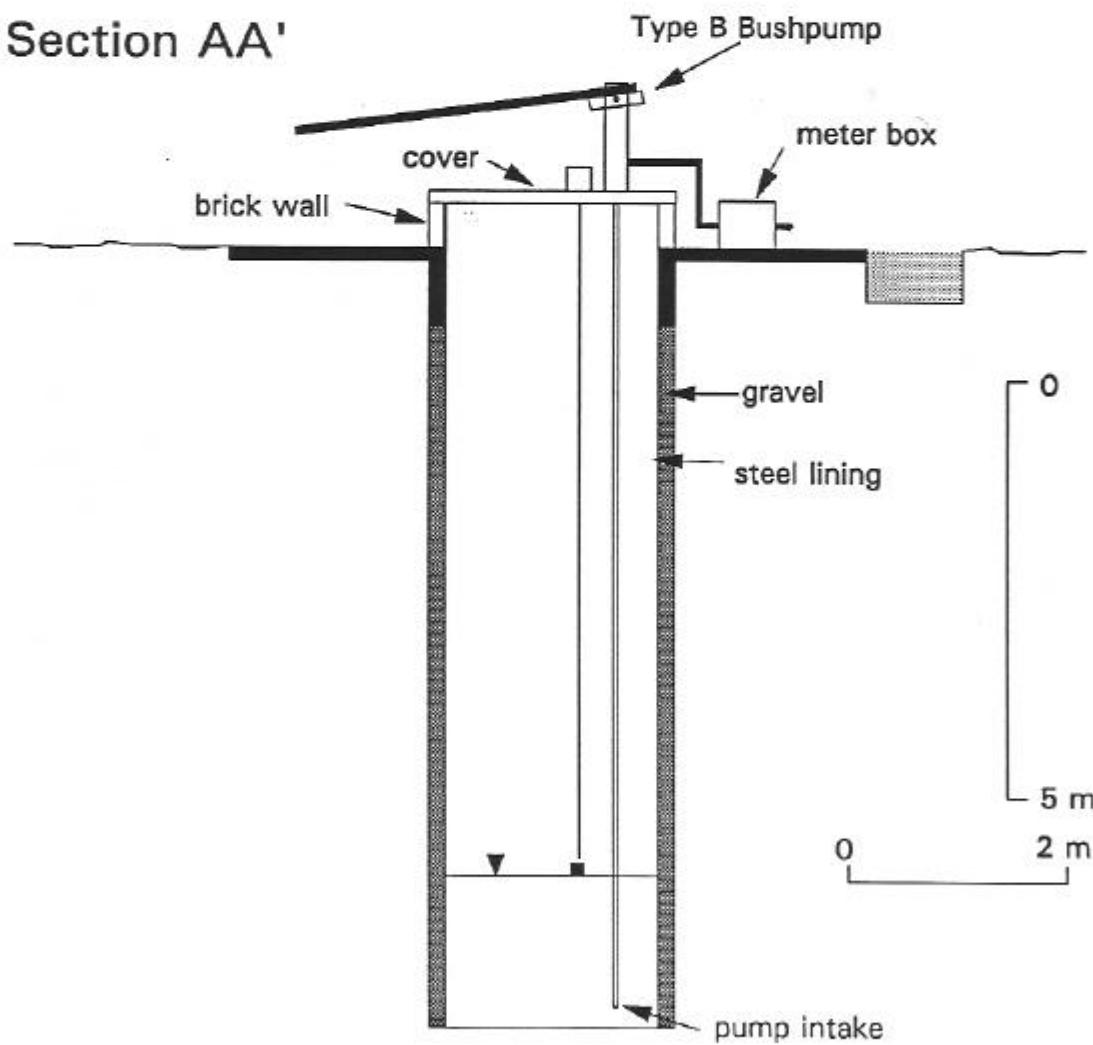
Collector well and headworks construction, site 7, Machoka
